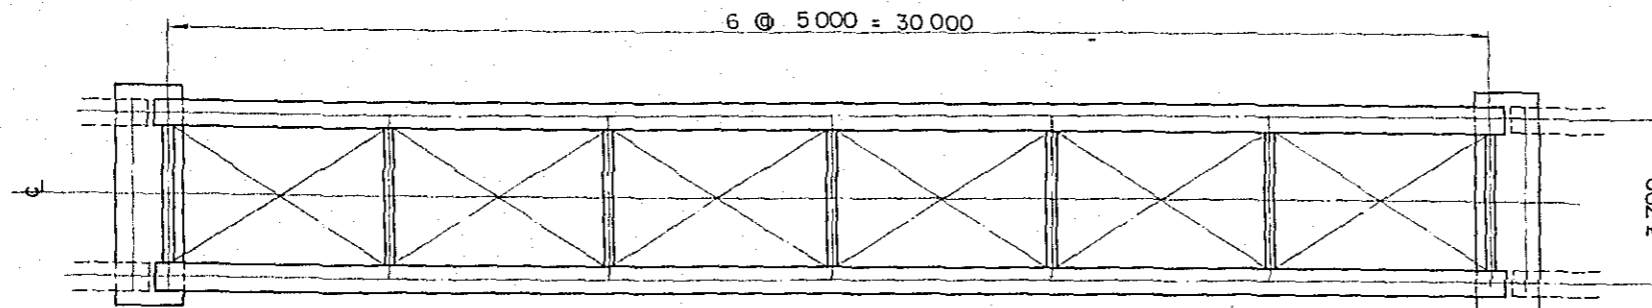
(5) STANDARD PRESTRESSED CONCRETE BEAM
